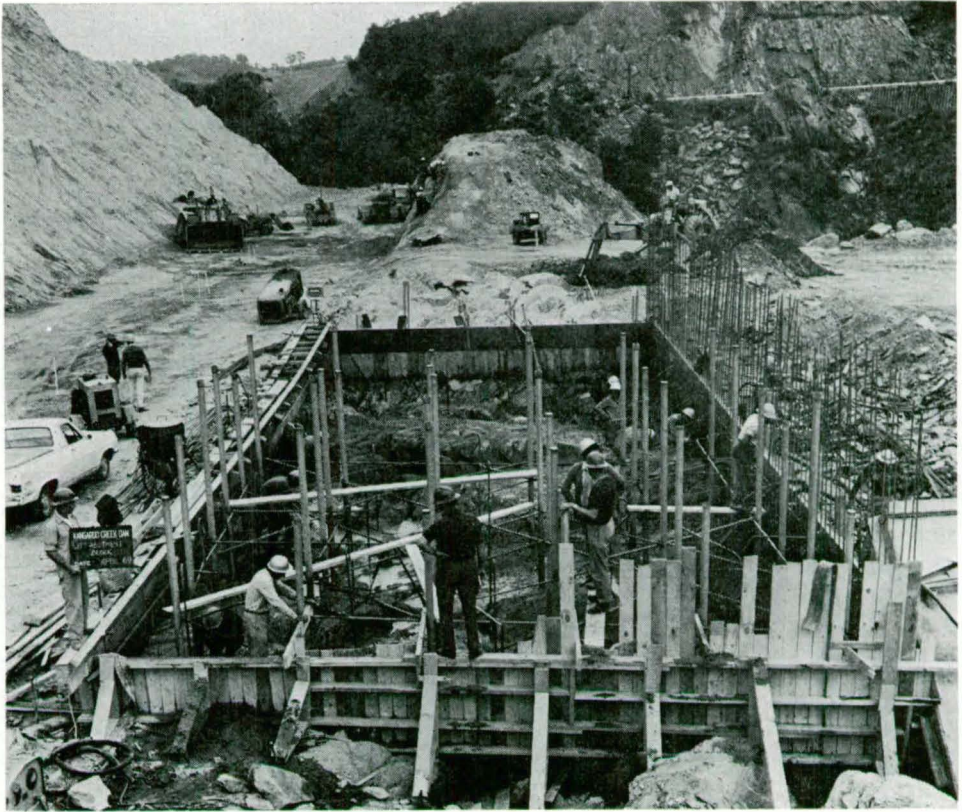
Erection of form work, reinforcement and grout pipes for left abutment block, after treatment of open-jointed area at upstream end.
